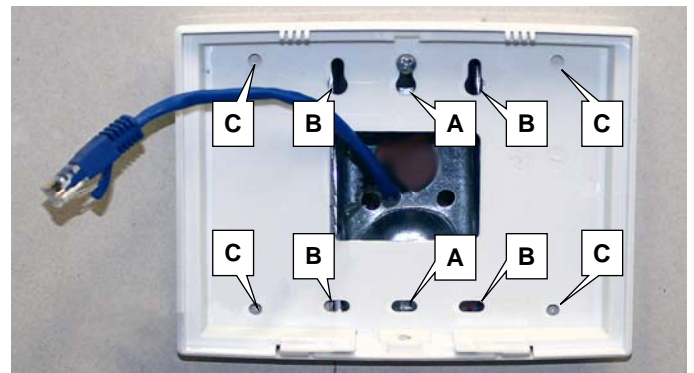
Rear housing mounting holes for single-gang (A) and double-gang (B) electrical boxes, and four all-purpose holes (C)
